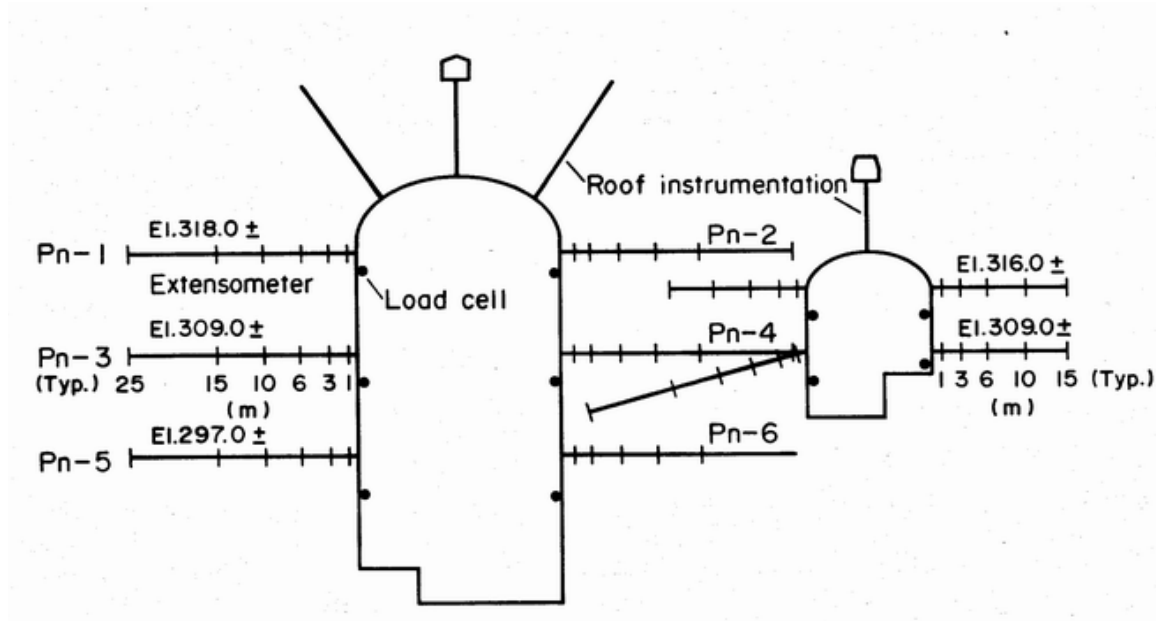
Typical layout of sidewall extensometers for the Mingtan underground complex.
